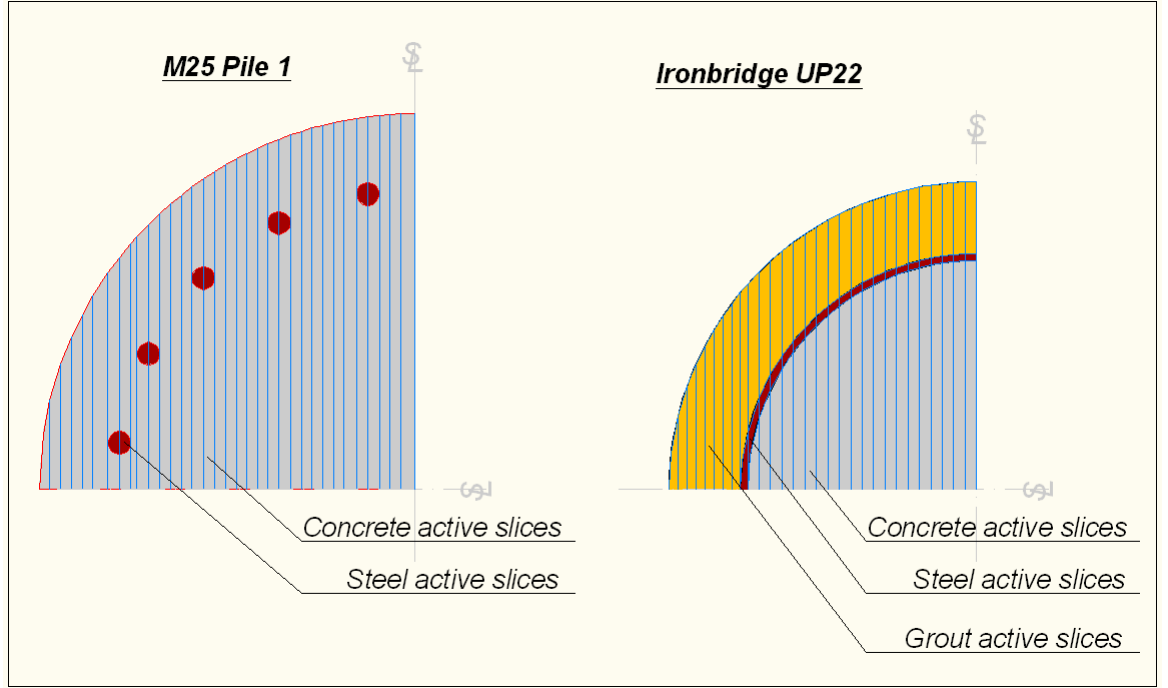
Division of a standard reinforced concrete section and a concrete filled steel tubular pile section into slices for the calculation of the bending moment. Only active slices are considered in the calculation, while the rest of the slices are considered to have area equal to zero, thus they do not resist any moment.
